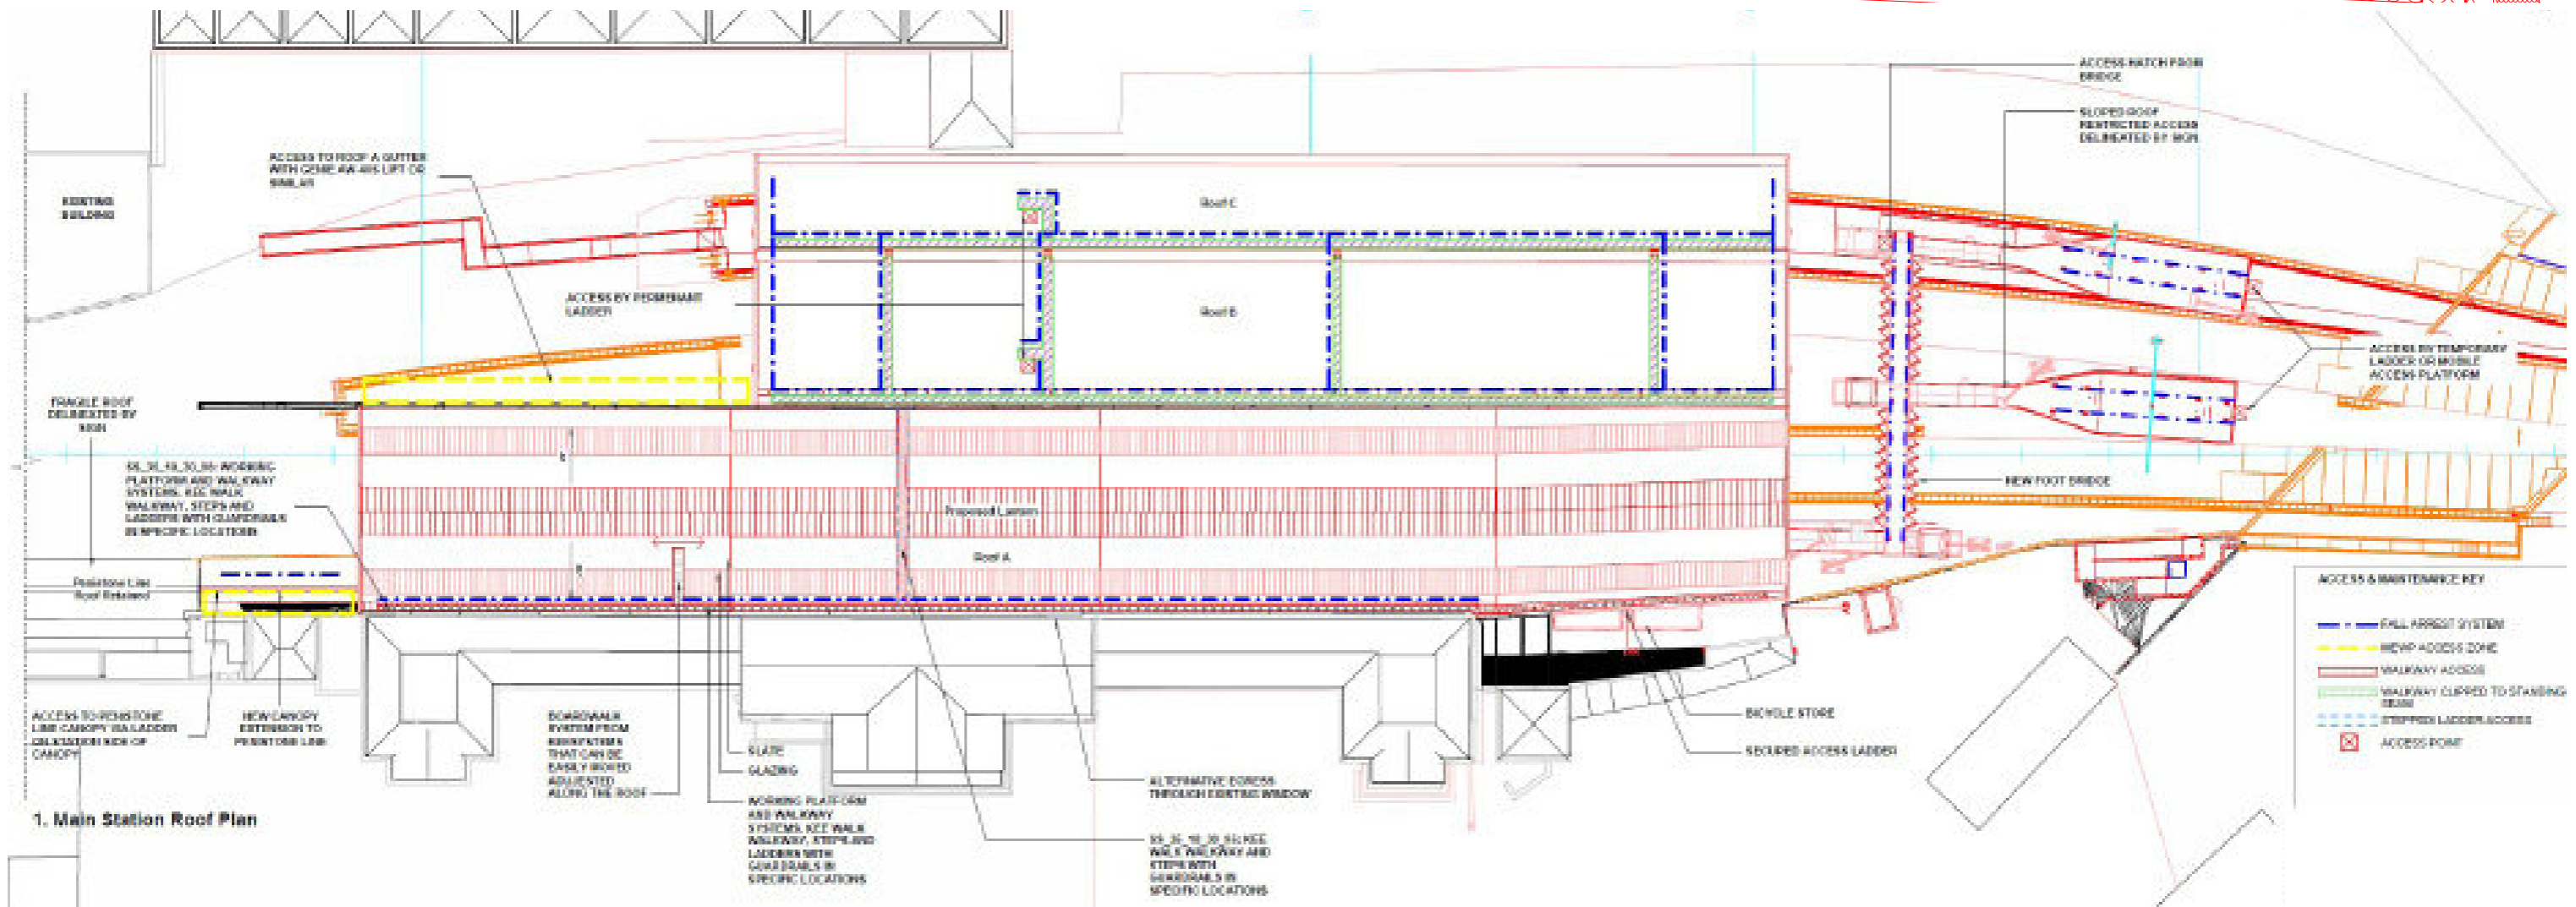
Proposed Roof Access and Maintenance Plan
